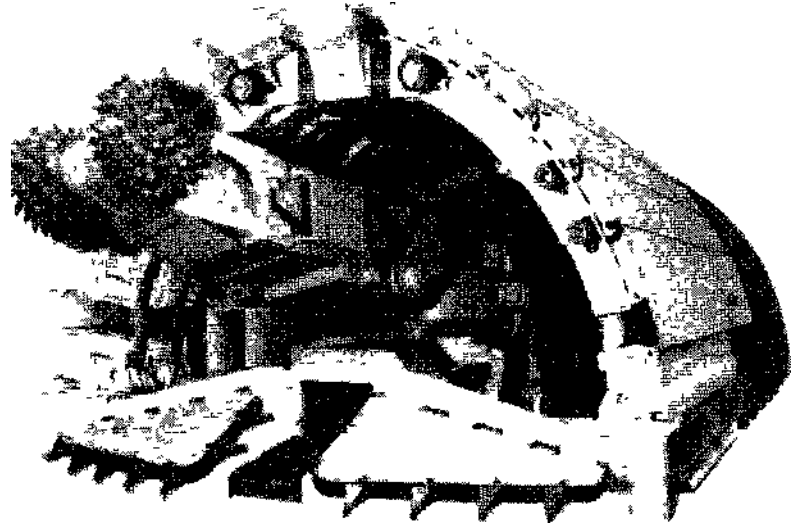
Blade shield with integrated sectional cutting machine and loading assembly for roadway drifage in coal mining.
